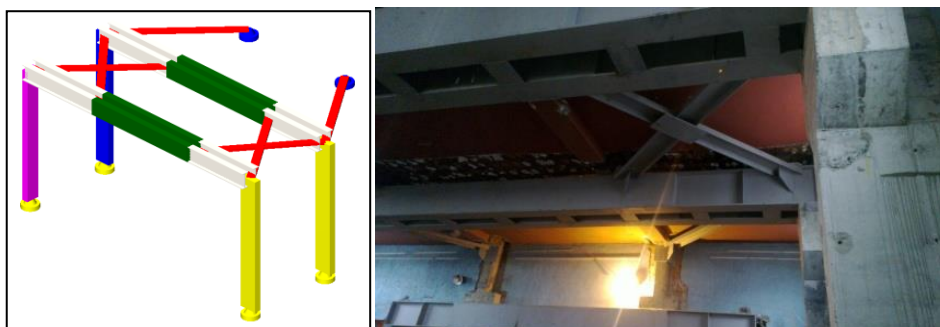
Structure of the transverse steel girder and the reinforced concrete columns
